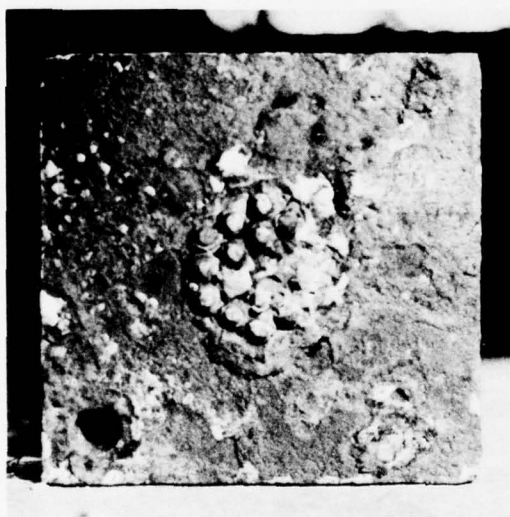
Heavy rust on outside face of the seaward anchorage and strands in beam 19
